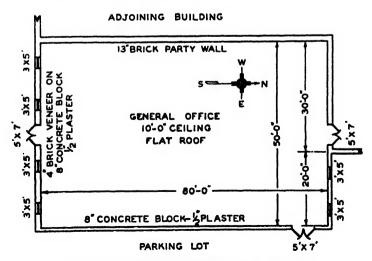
PLAN OF ONE-STORY OFFICE BUILDING
